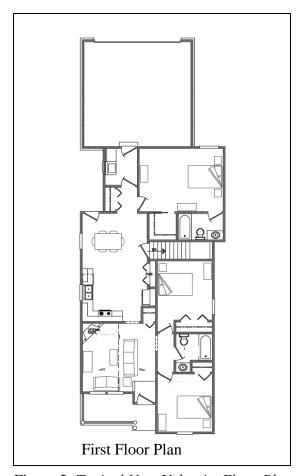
Typical New Urbanist Floor Plan* Courtesy of Livonia Builders, retrieved from: http://www.michbuilder.com/maple/
